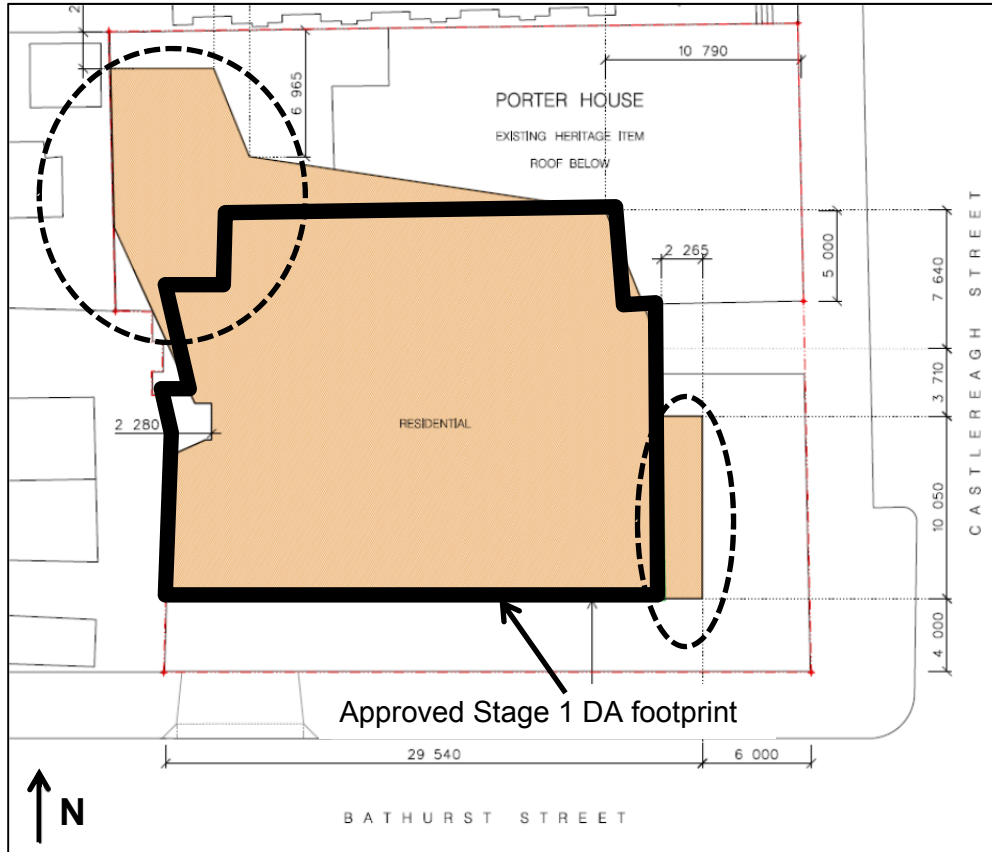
A typical tower floor plate illustrating the locations where variation is proposed to the Stage 1 building envelope
